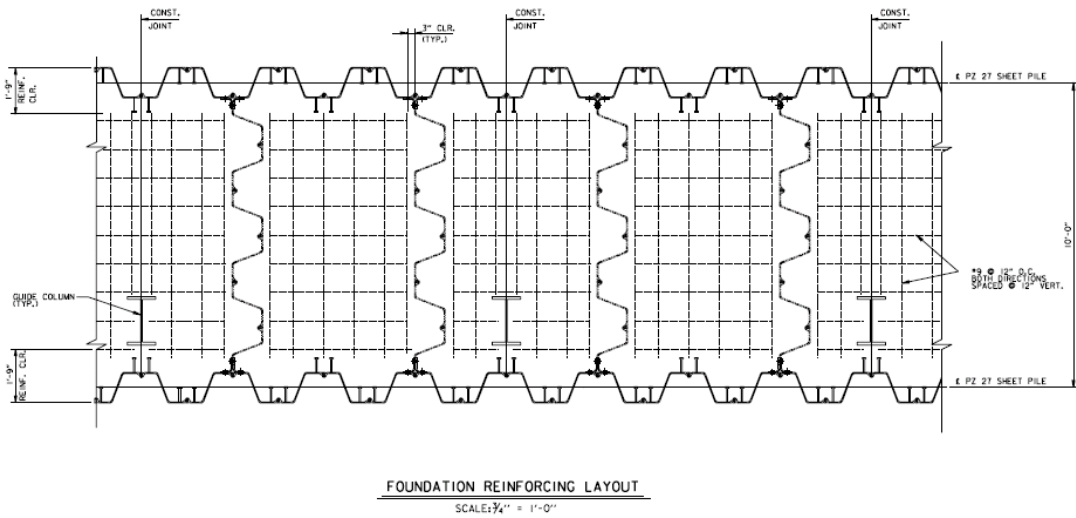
London Avenue Phase 1 Gate Sill Cap Partial Plan
